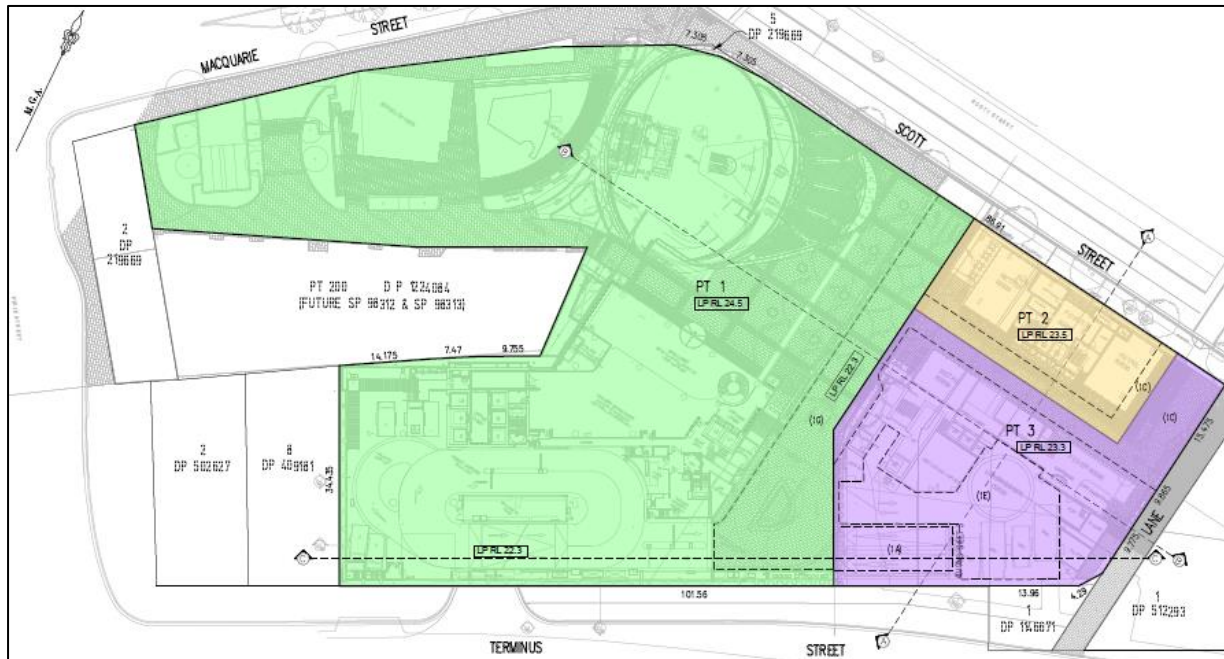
Proposed lower ground level subdivision layout plan (Source: David John Carrey).
